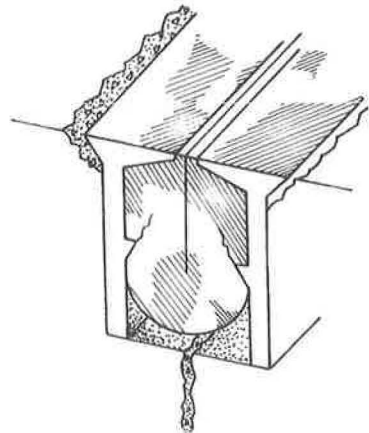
Cantilevered retainer assembly installed in spalled joint.
